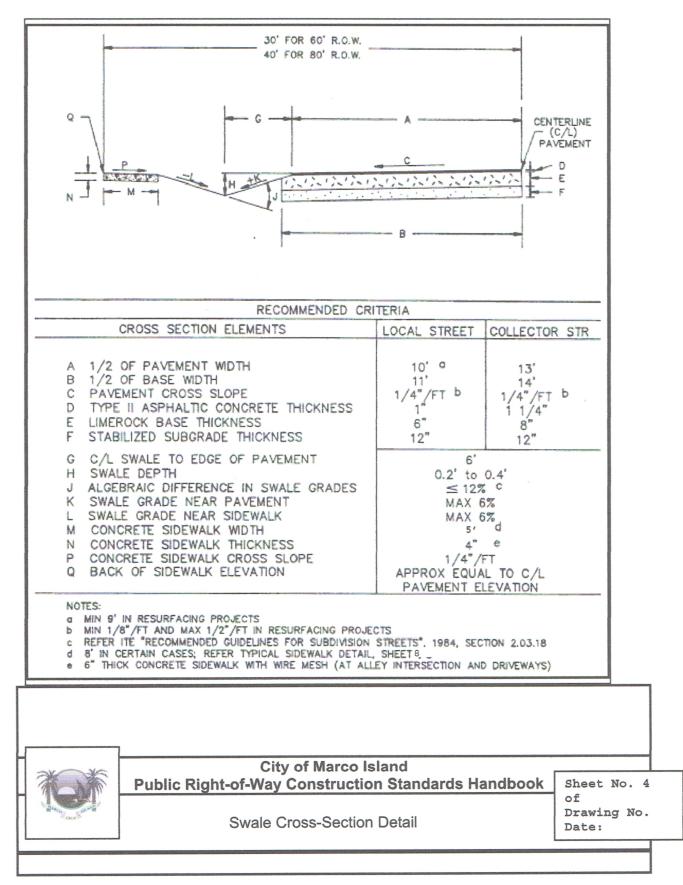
Typical Cross-section of a Conveyance Swale without Swale Blocks
